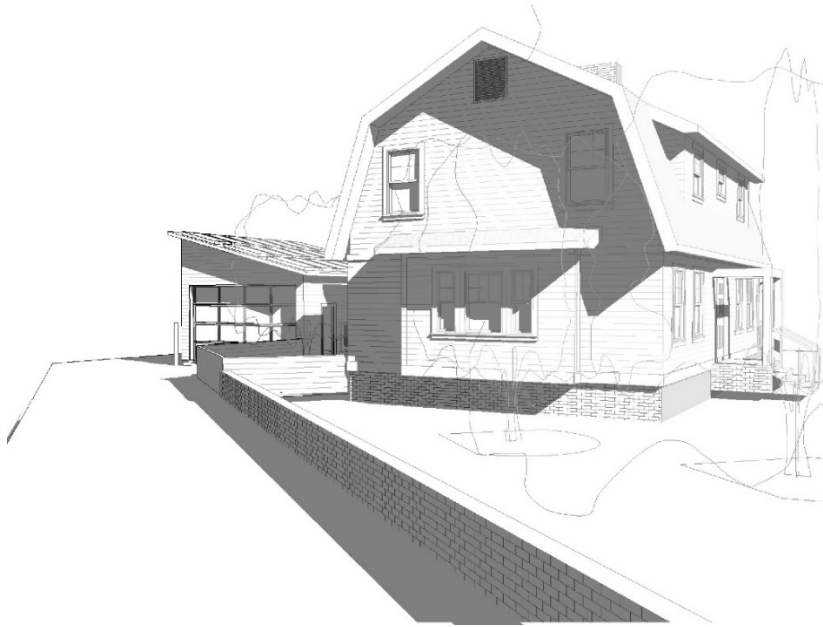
Rendering showing view from intersection of Floral and alley entrance
